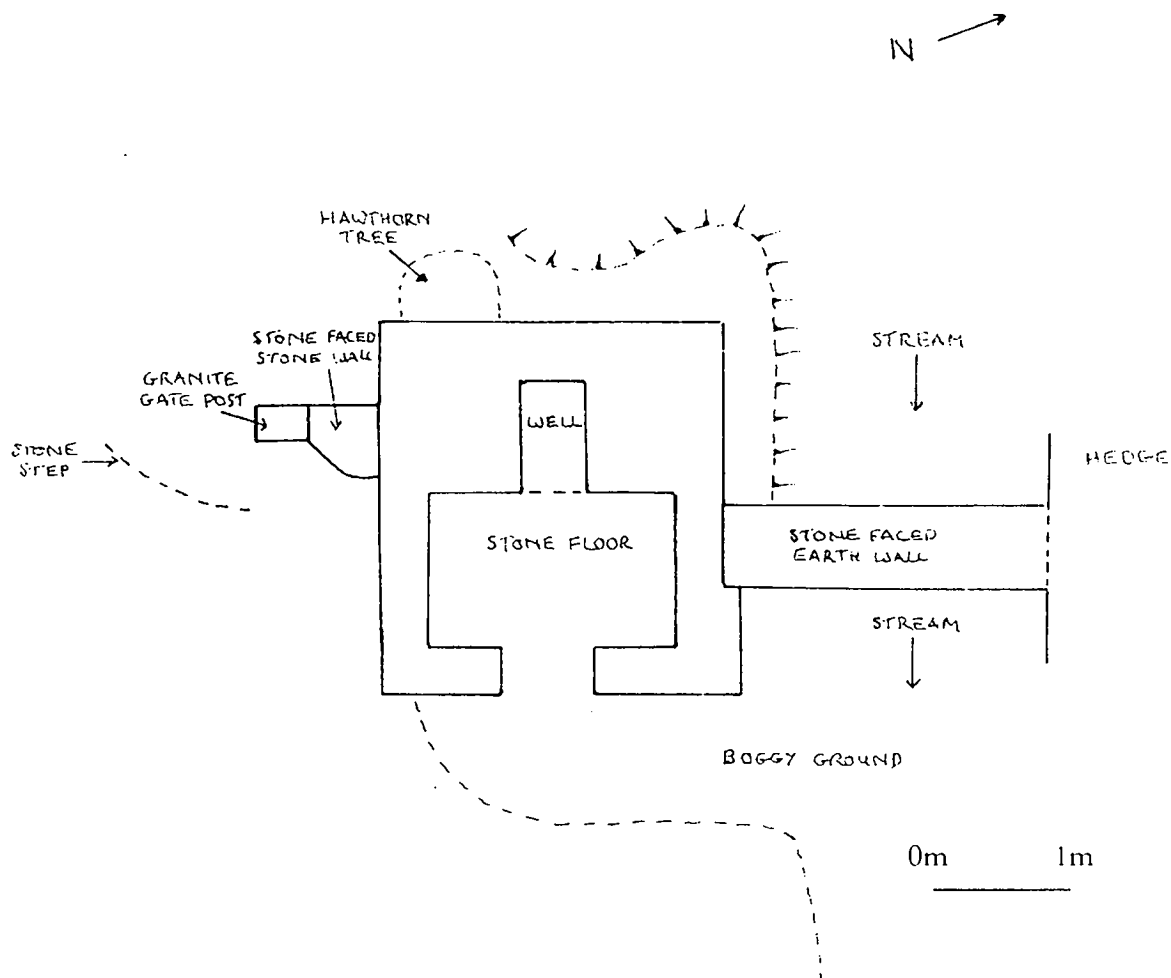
Plan of Trelill Holy Well (by Jo Sturgess)
